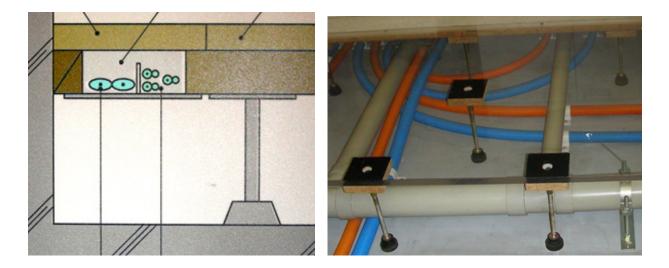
Kodan SUPPORT & INFILL (KSI), raised floor components, Tokyo, Japan
